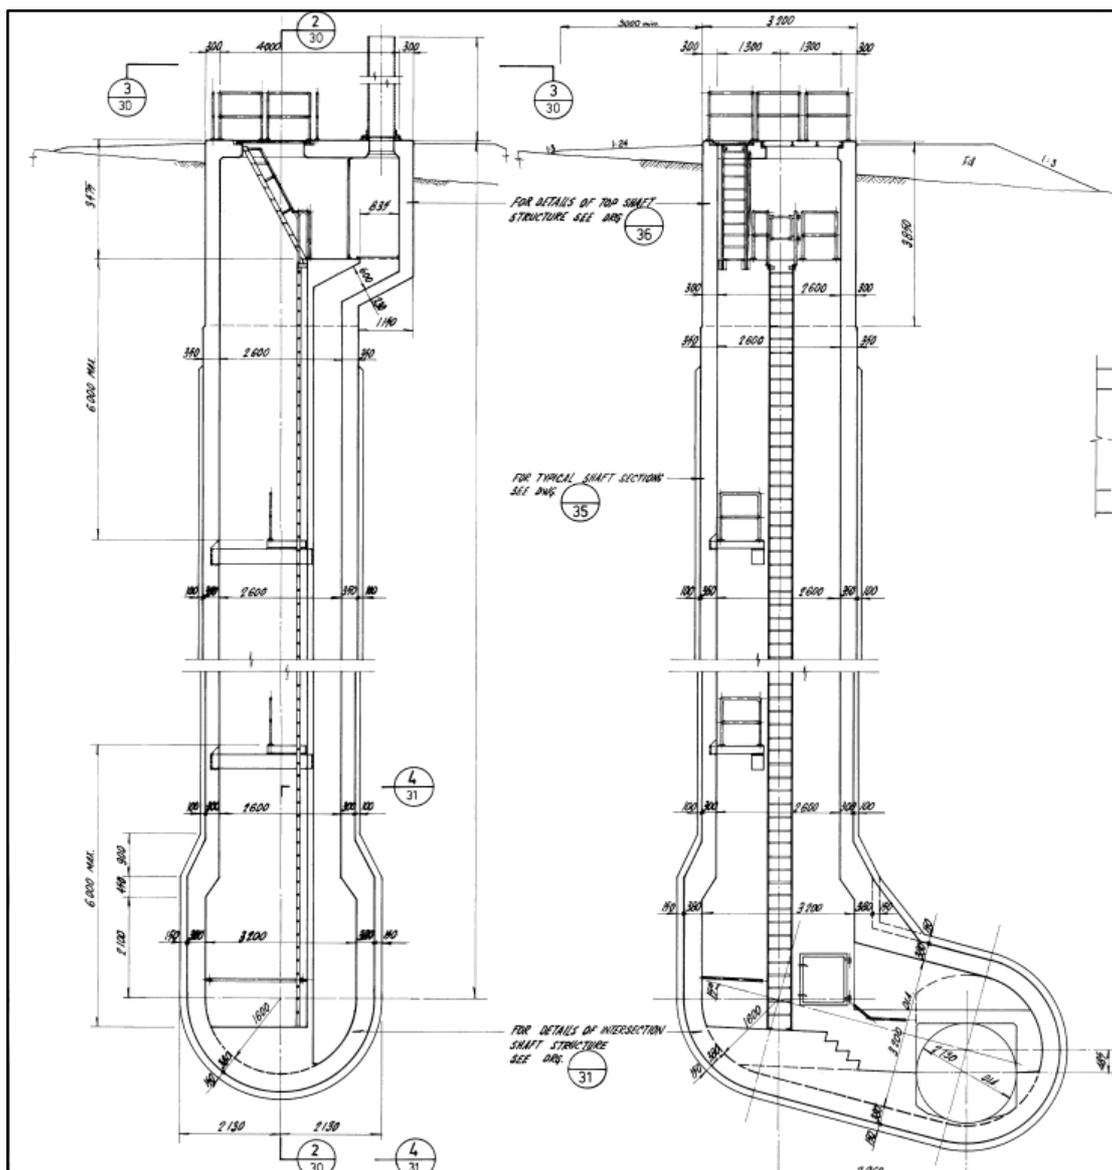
Schematic of sewerage structures at Shaft 2 and Shaft 3. (Refer to Attachment 2, Drawing No. CD75/500/1)
